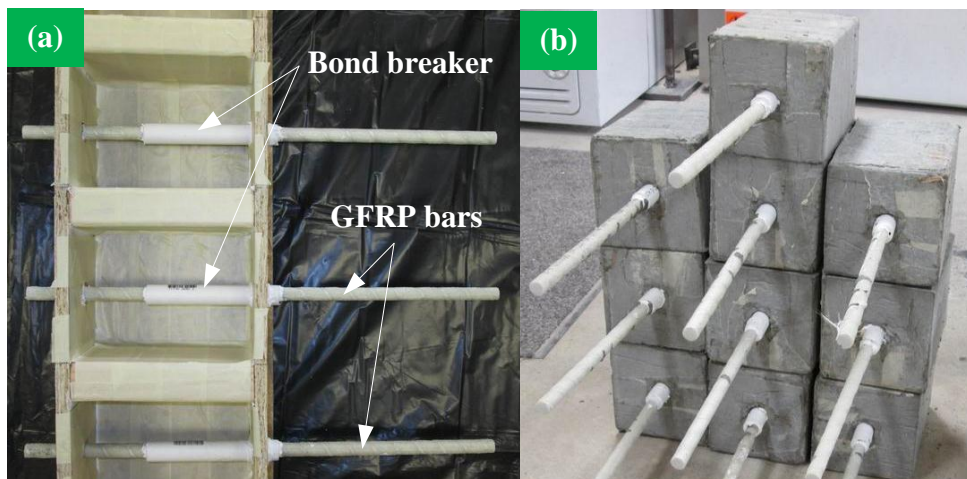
Specimen design: (a) GFRP bars in formwork before concrete pouring and (b) specimens after concrete cast
